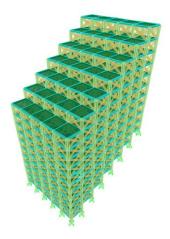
3D view of GFRG panel equivalent strut setback step-back building.
